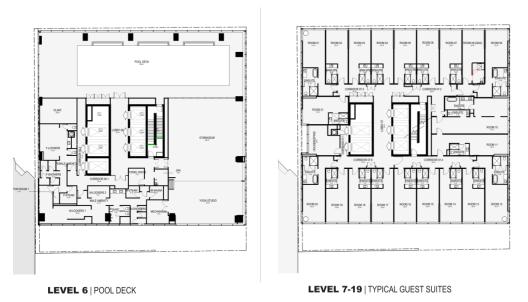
The building's footprint remains consistent on the majority of floors, resulting in minimal exposed floors and ceilings throughout the building.
